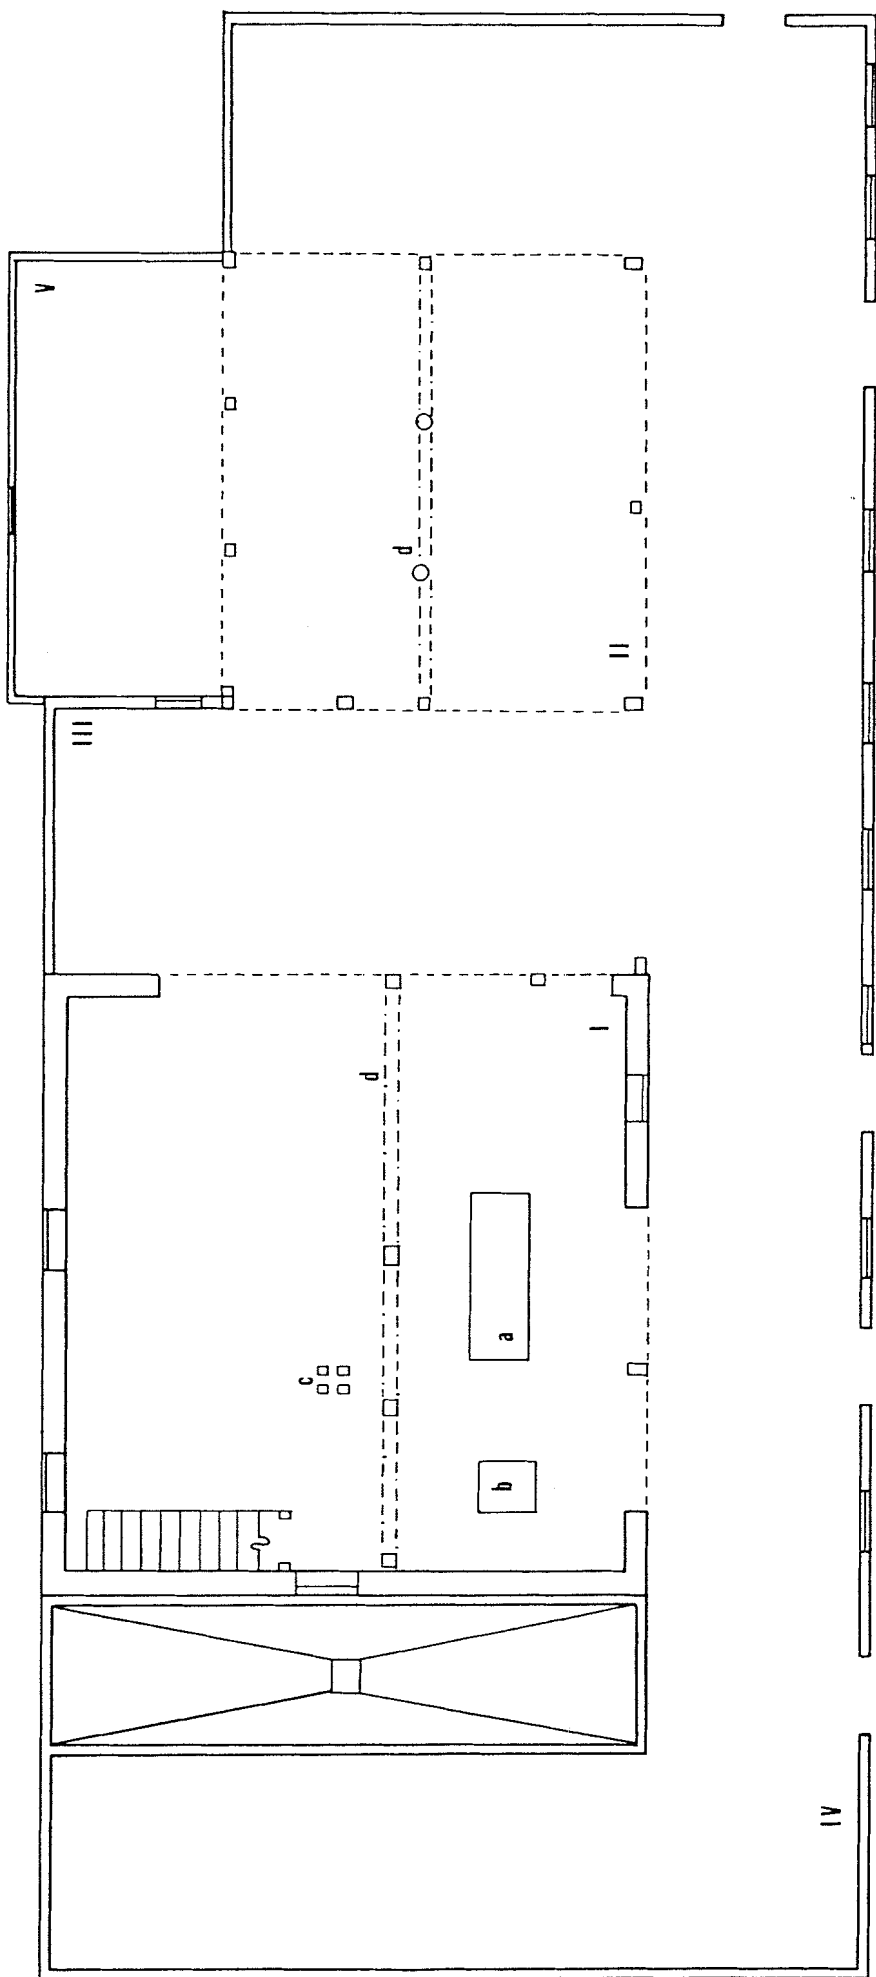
Duck Creek Mill, basement floor plan showing extant drive train and line shafting.
